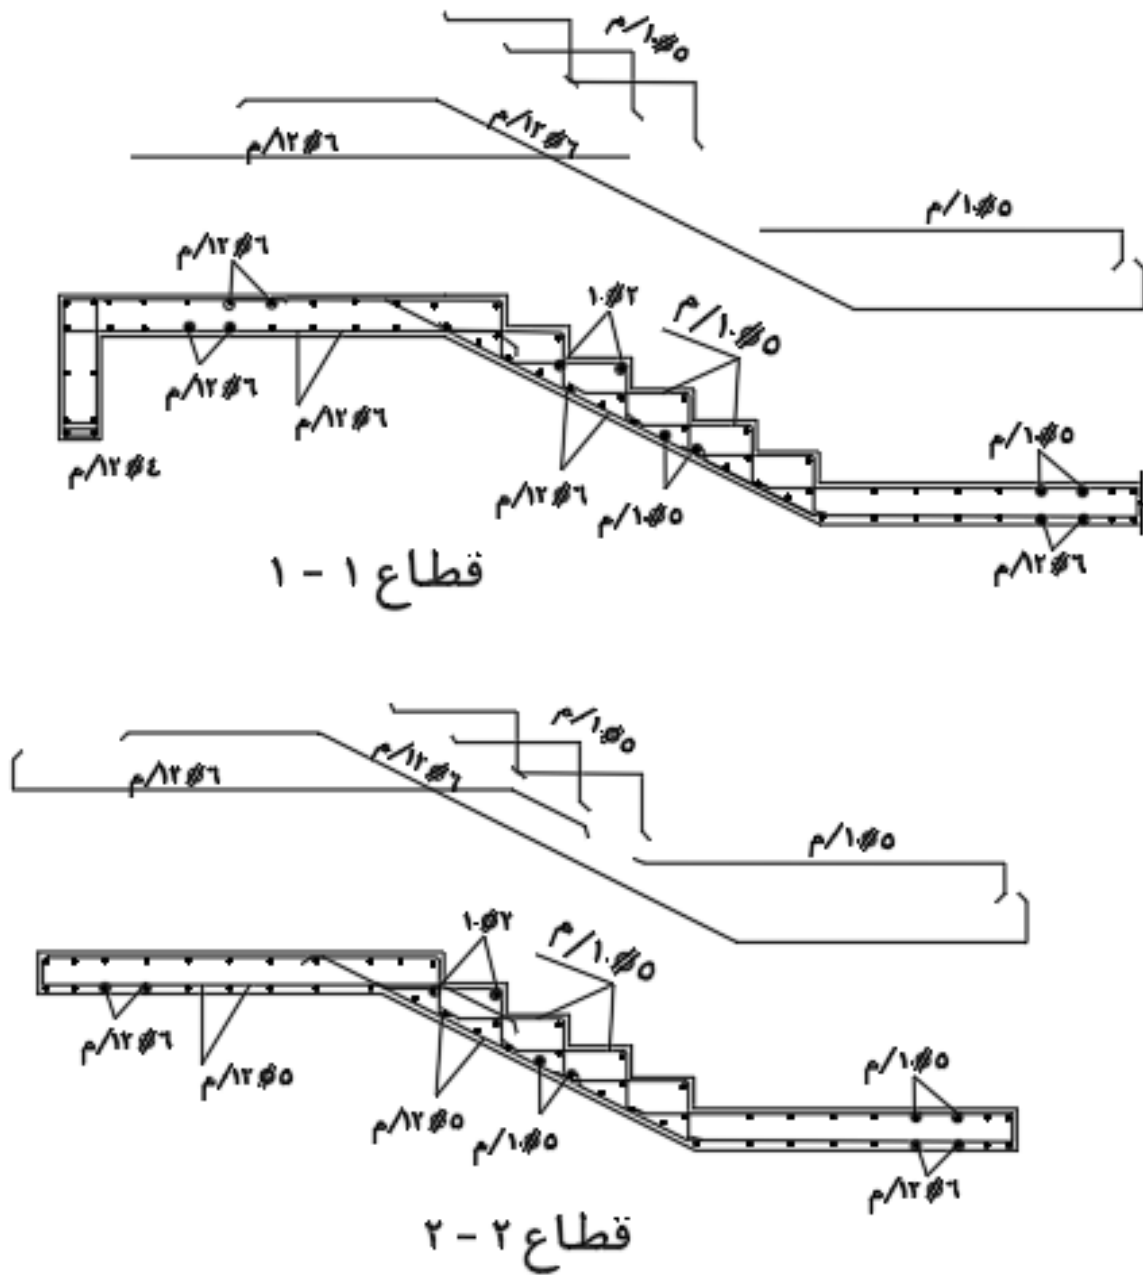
Reinforcement in sec1-1 and sec 2-2
